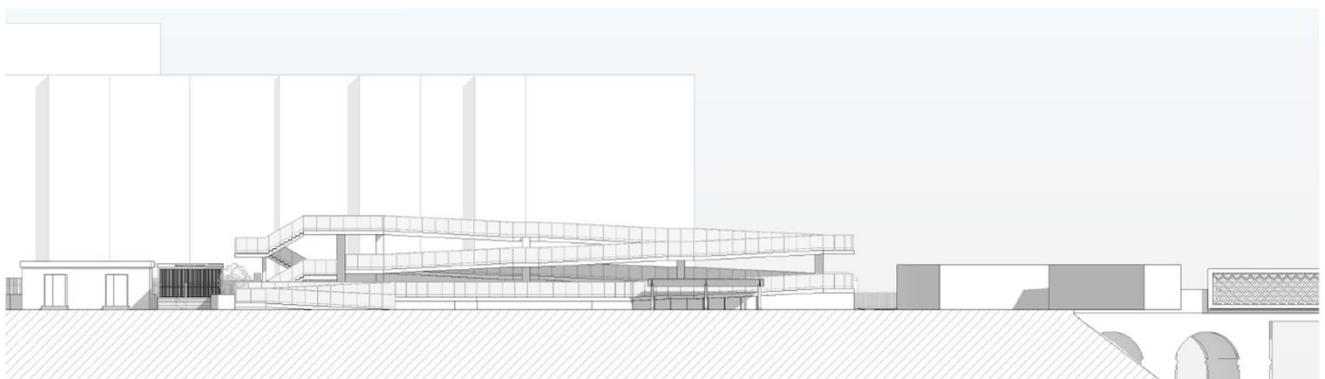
Proposed Heuston West Station, Elevation, East Elevation
